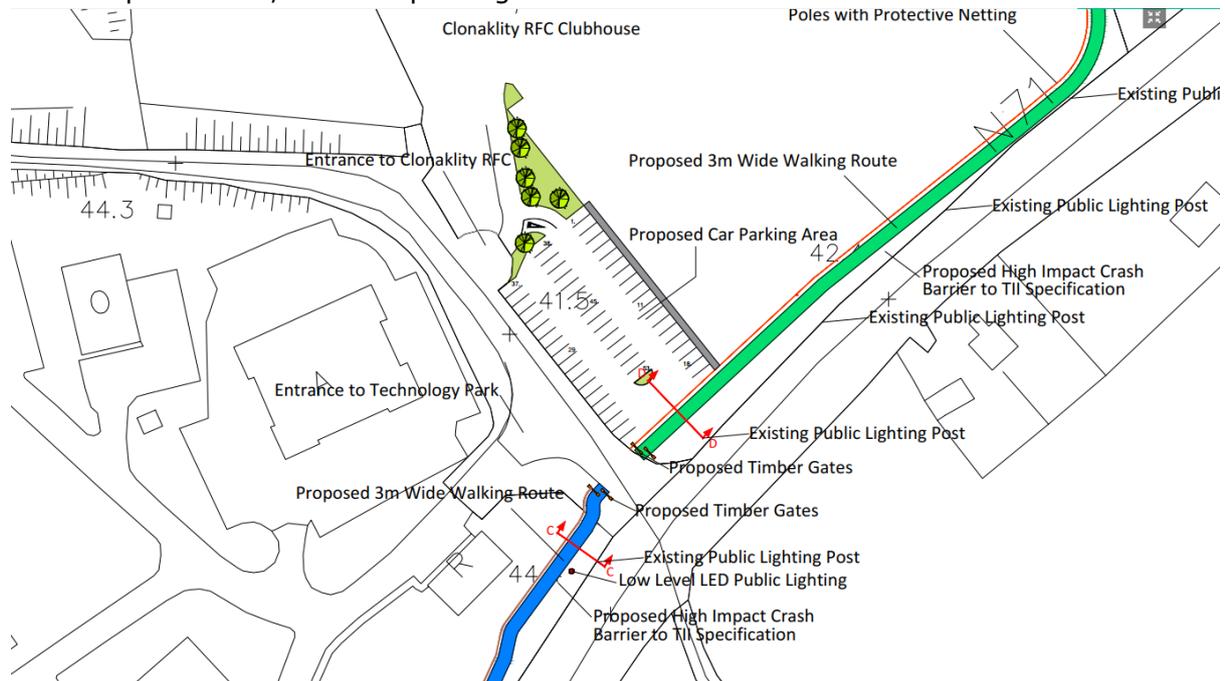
Site layout showing parking proposals (Credit: Tadhg Casey Architects)
